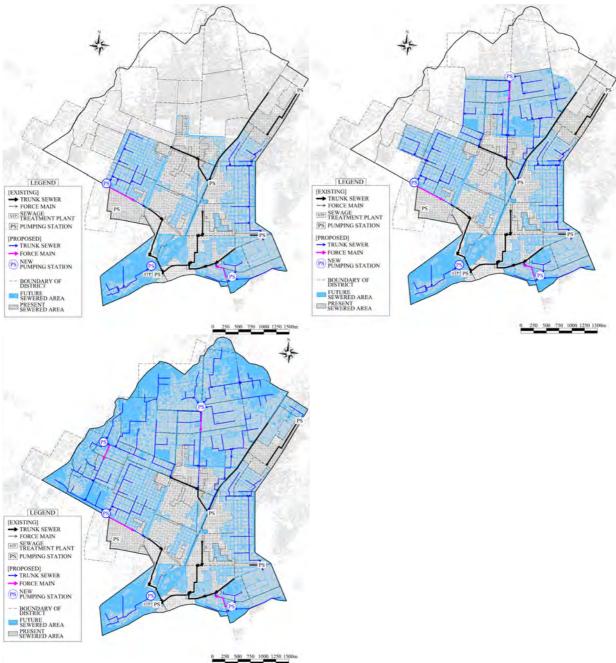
Layout Plan of Alternatives (Sewer Network)
